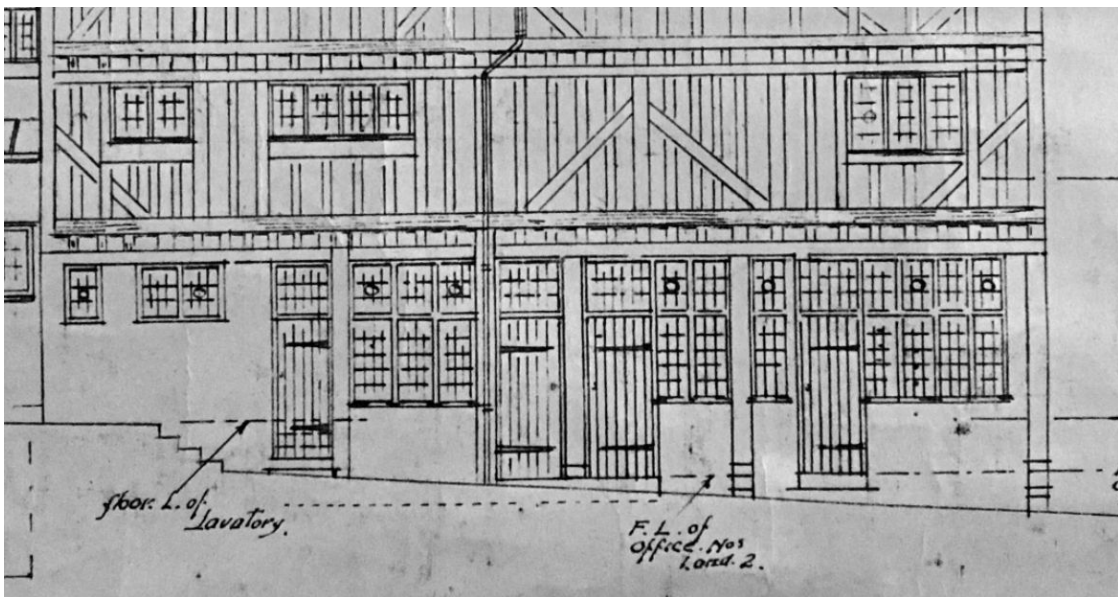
Detail from Yorke's 1925 proposed ground-floor elevation of Building B.
